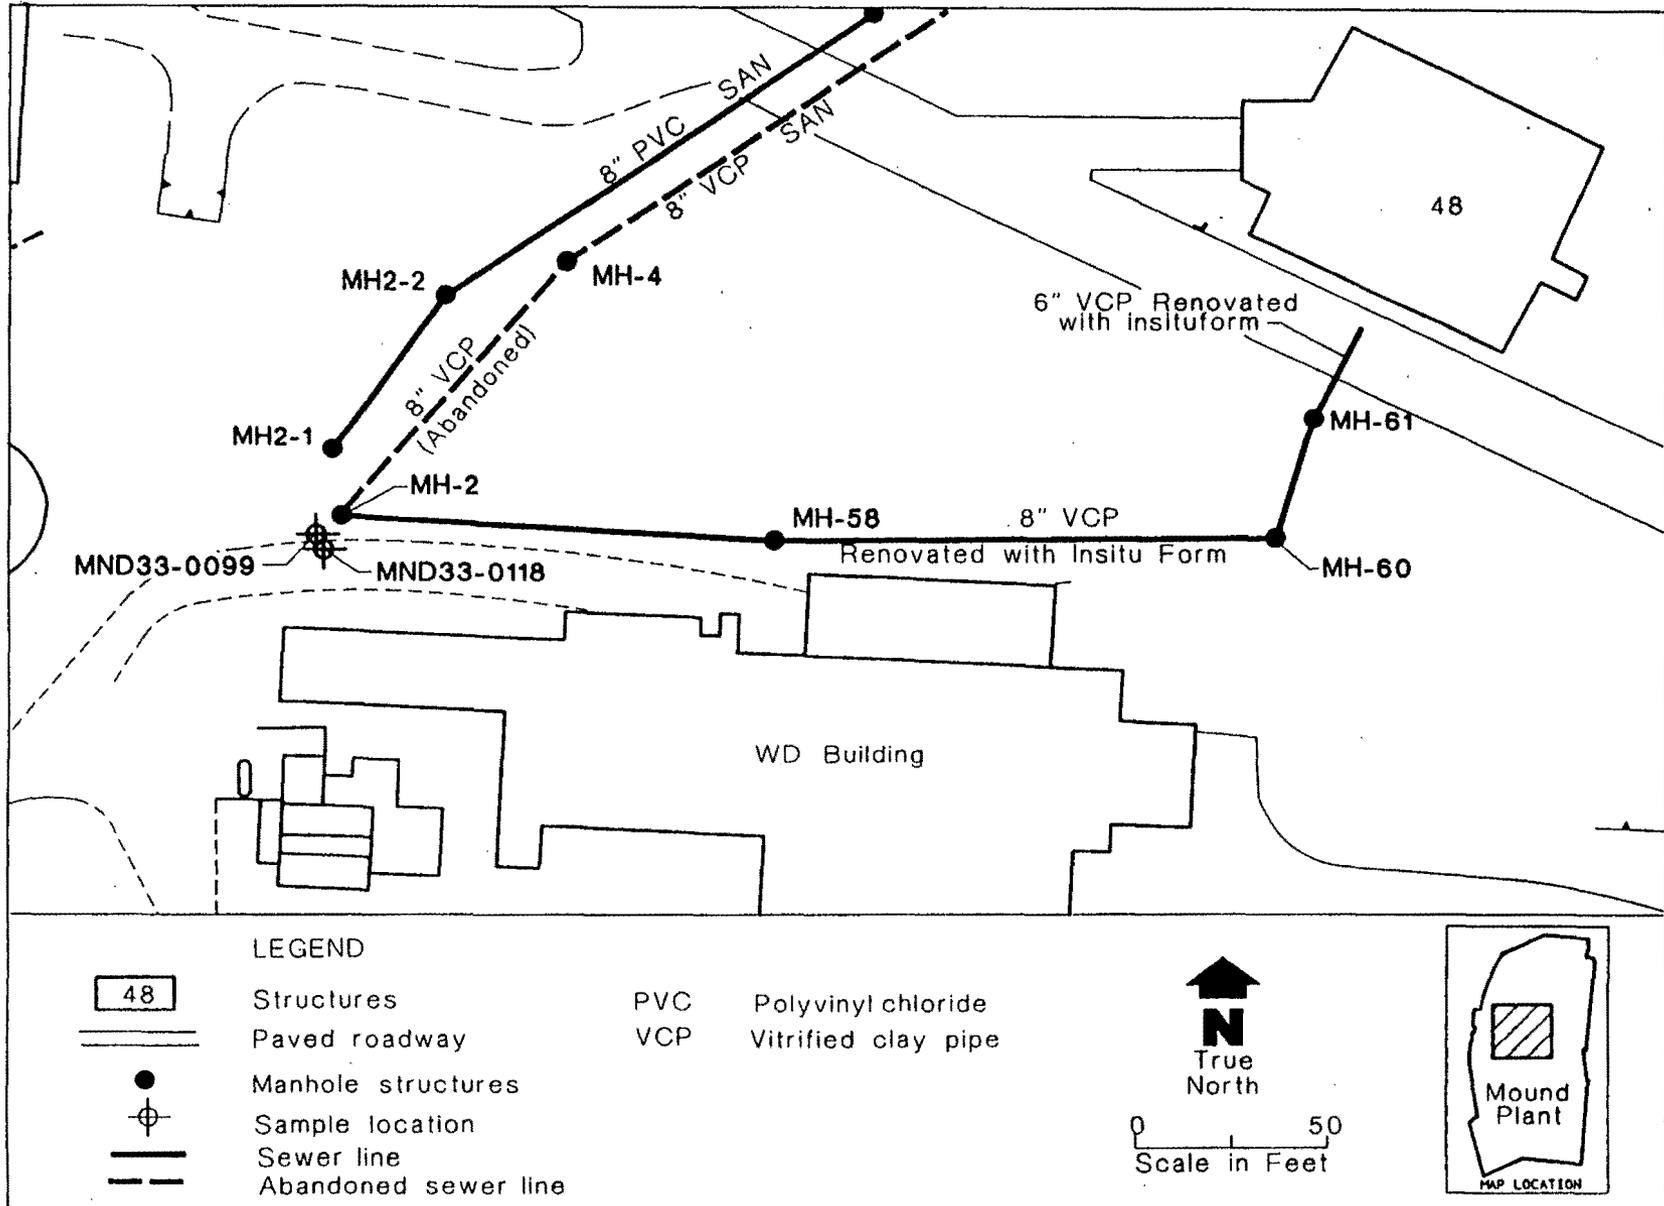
Underground sewer lines Grid G24 soil sample locations.
